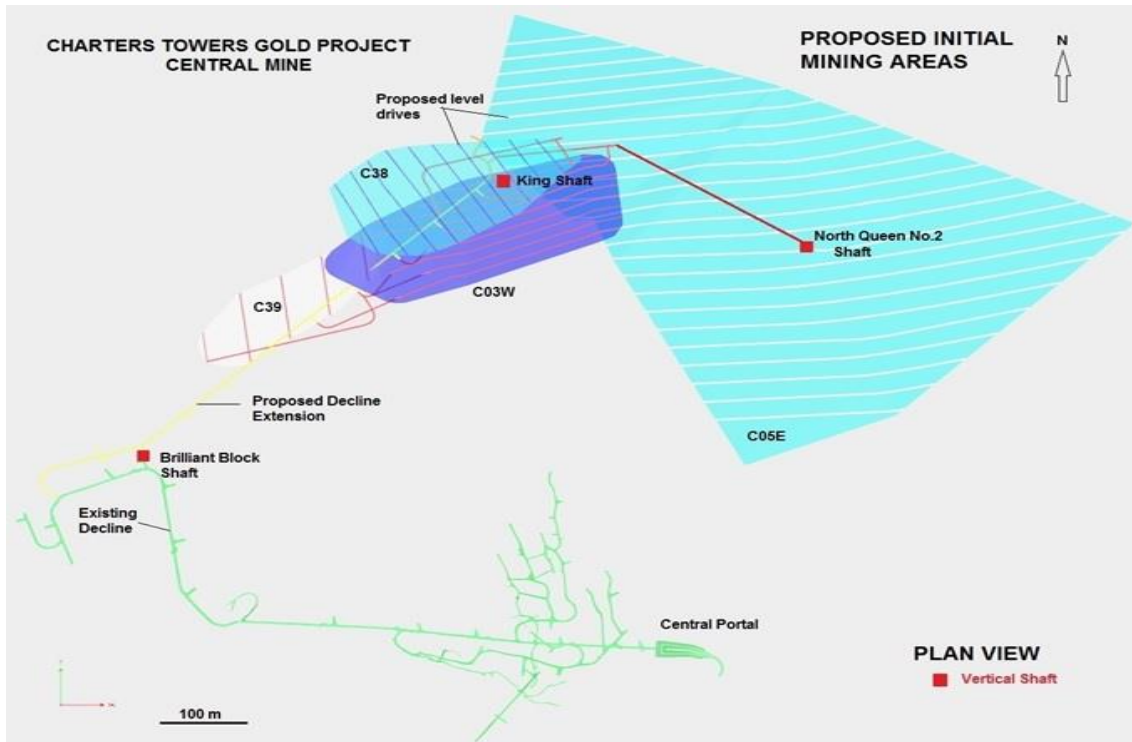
Proposed Initial Mining Areas – Plan View (Source: Citigold 2020 Business Plan)
